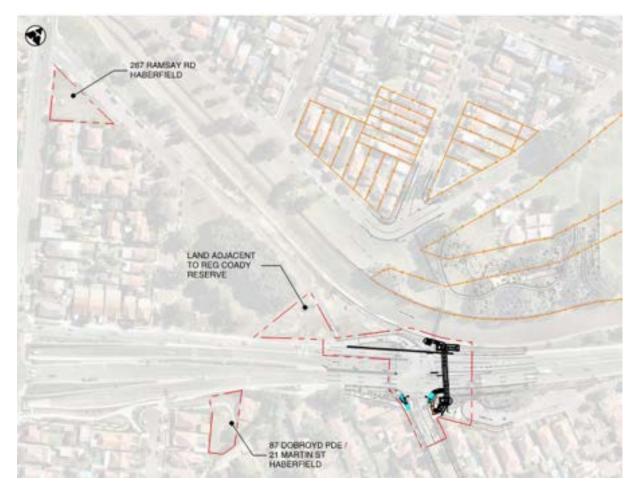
Proposed footprint of the proposal (Source: Stantec, 2023)
